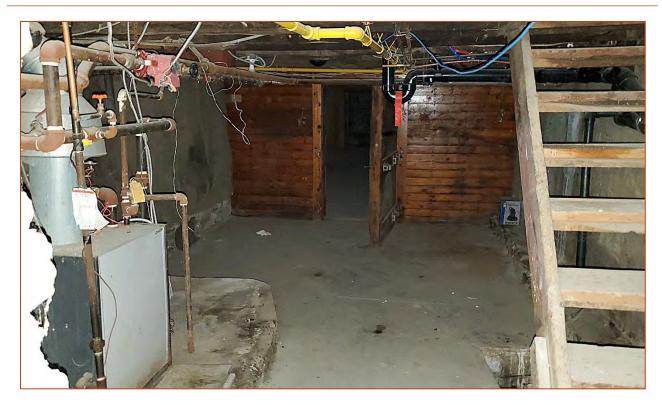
View southwest showing the centre basement room beneath the main building on 52 Main Street North
